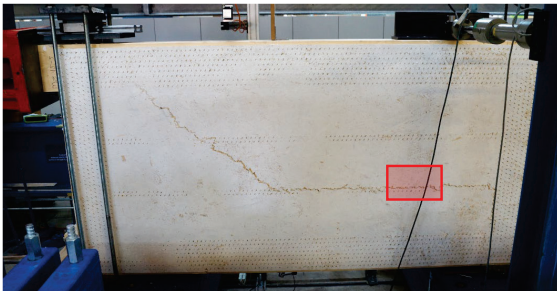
The initial failure in the 12-S-2 shear wall test occurred along the fastener row on the lower inner rail (marked in red).
